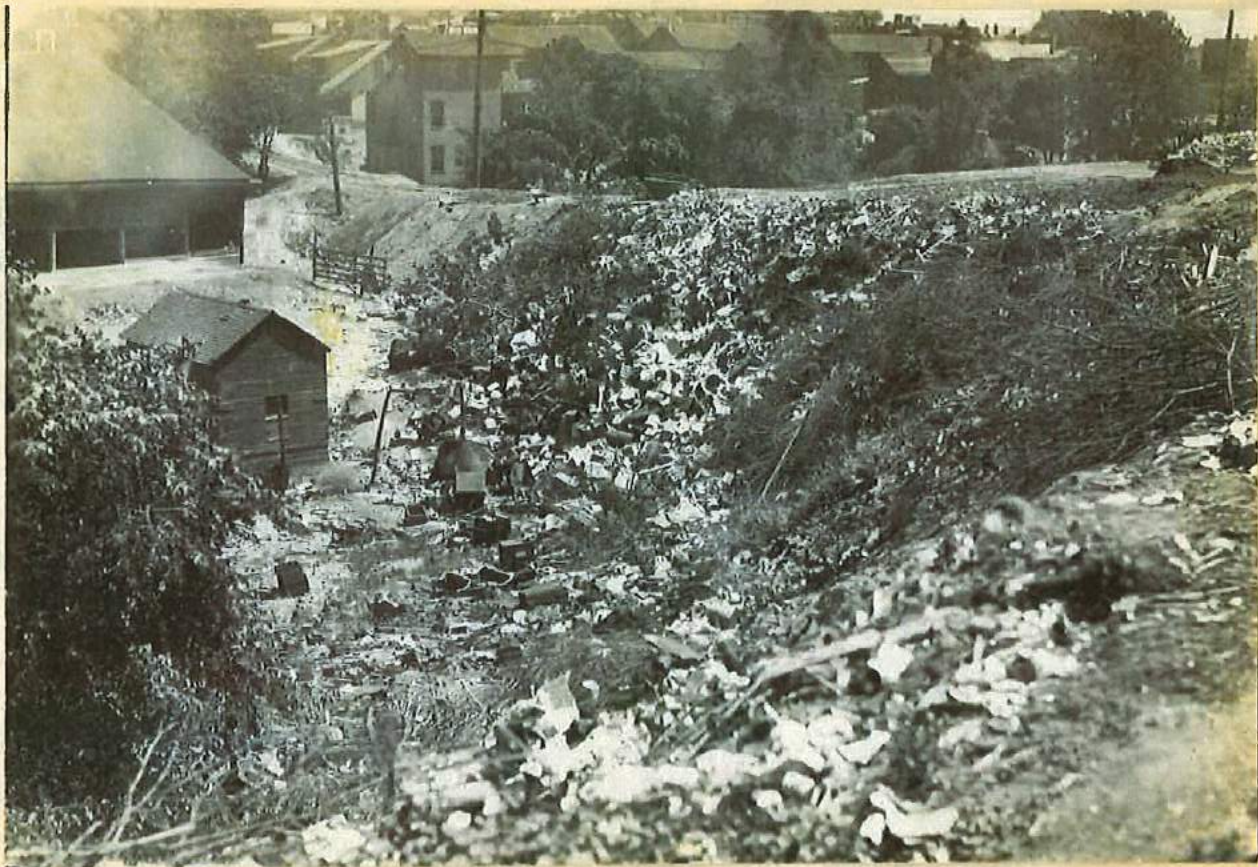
Jones Park Ravine, filling at Washington Street.
